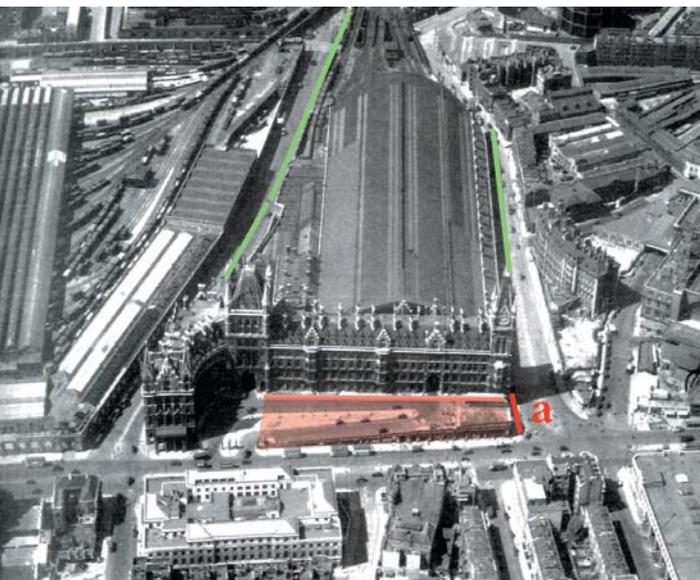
An aerial view of St Pancras showing the areas in which brickwork is affected: green – the CTRL project; red – the London Underground Limited project; (a) the London Underground demolition. (image but not annotations reproduced from Jack Simmons)
